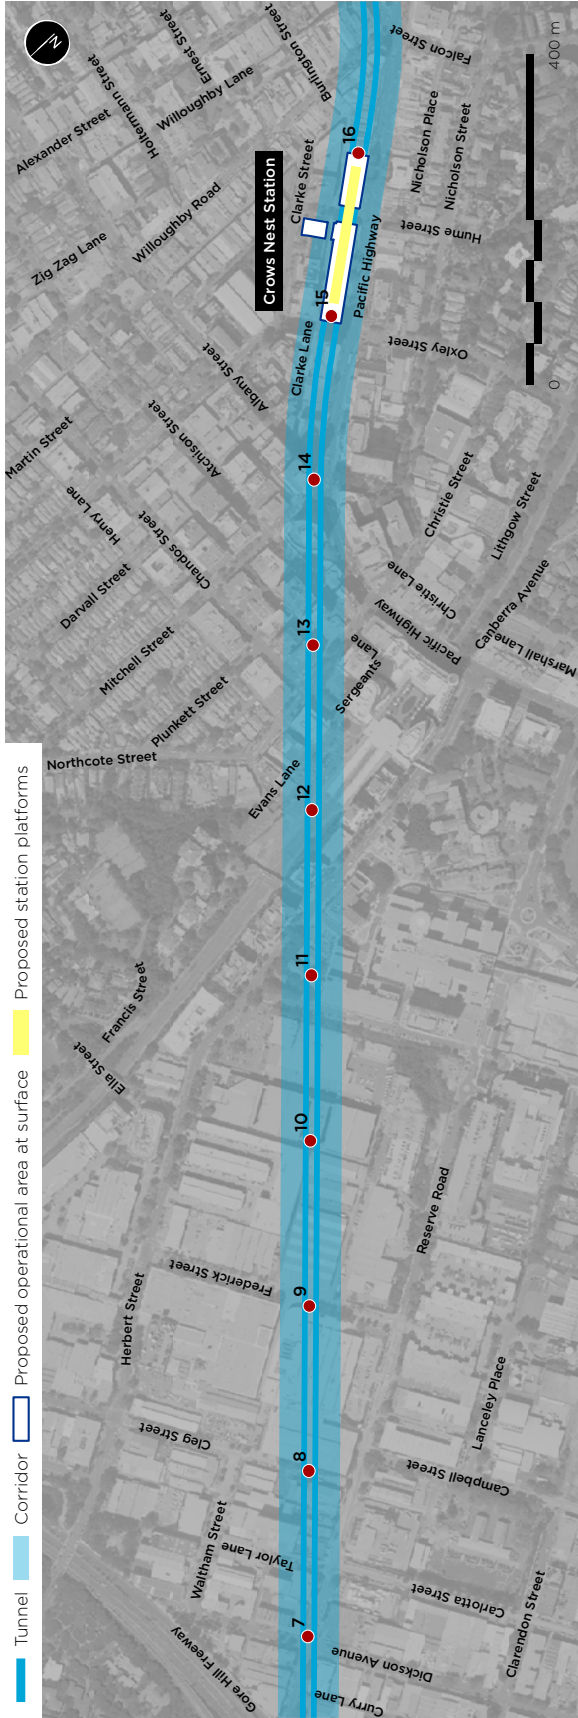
Indicative Chatswood to Sydenham alignment plan and long section
